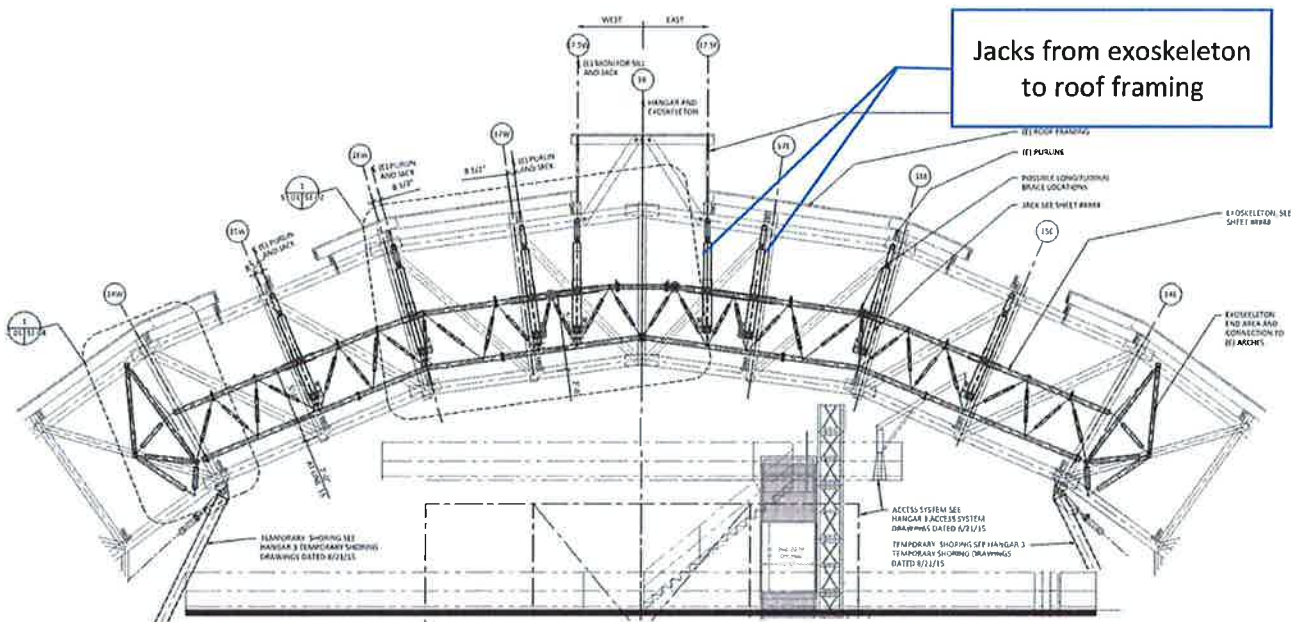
Exoskeleton Elevation (Preliminary Drawings)
